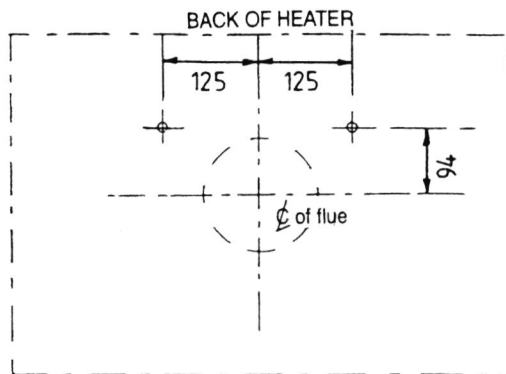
Locations for drilling hearth/floor for restraint bolts.
